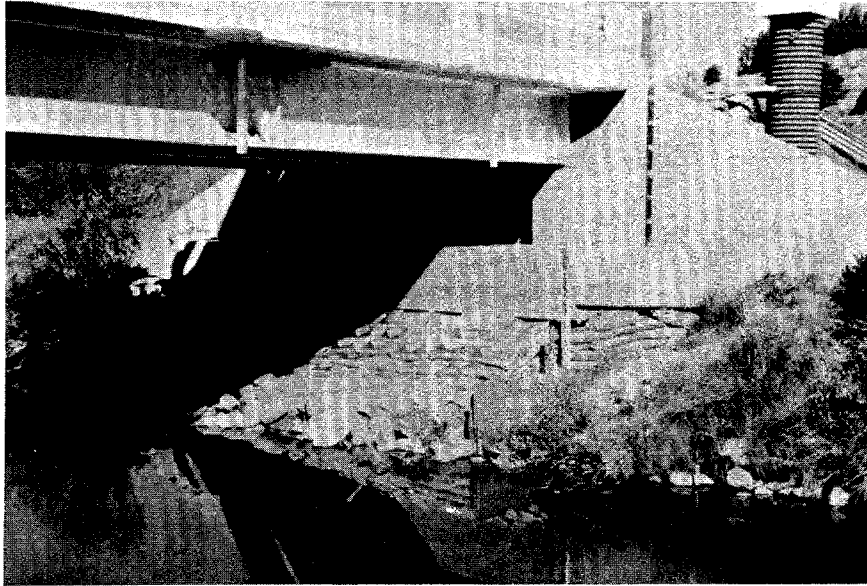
Placement of bags of premixed concrete at right bank abutment in 1975, to prevent lateral erosion. (From U.S. Forest Service.)
